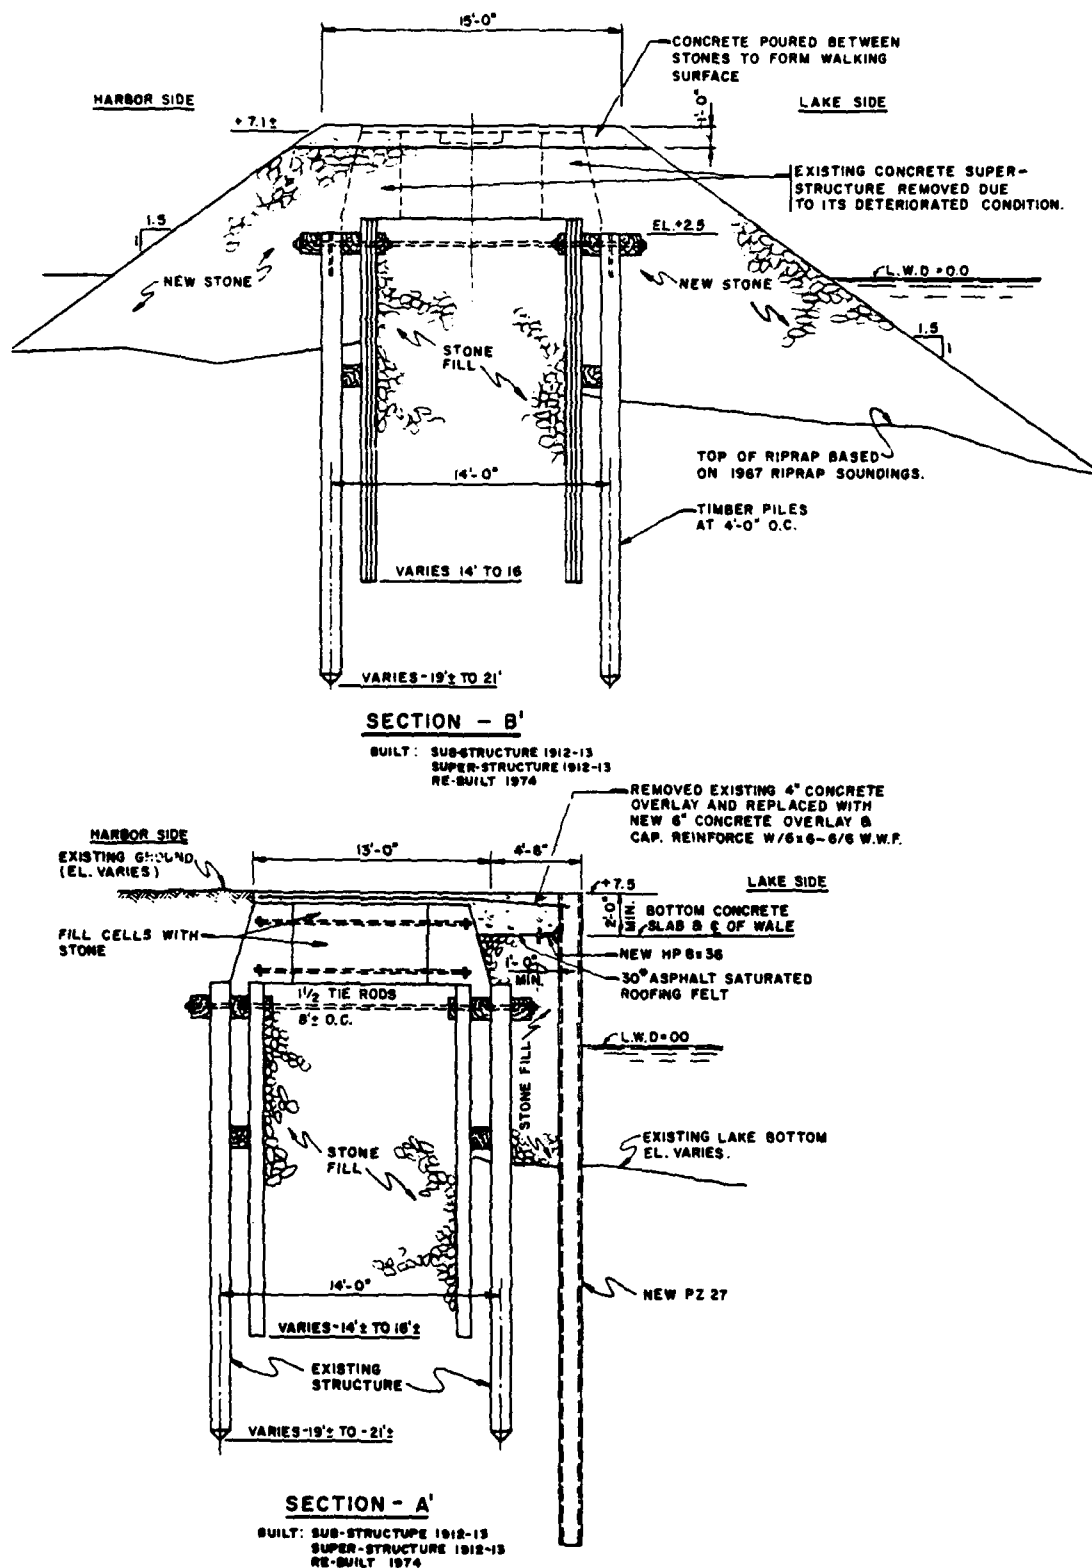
Typical structure cross sections, Racine Harbor, Wisconsin
